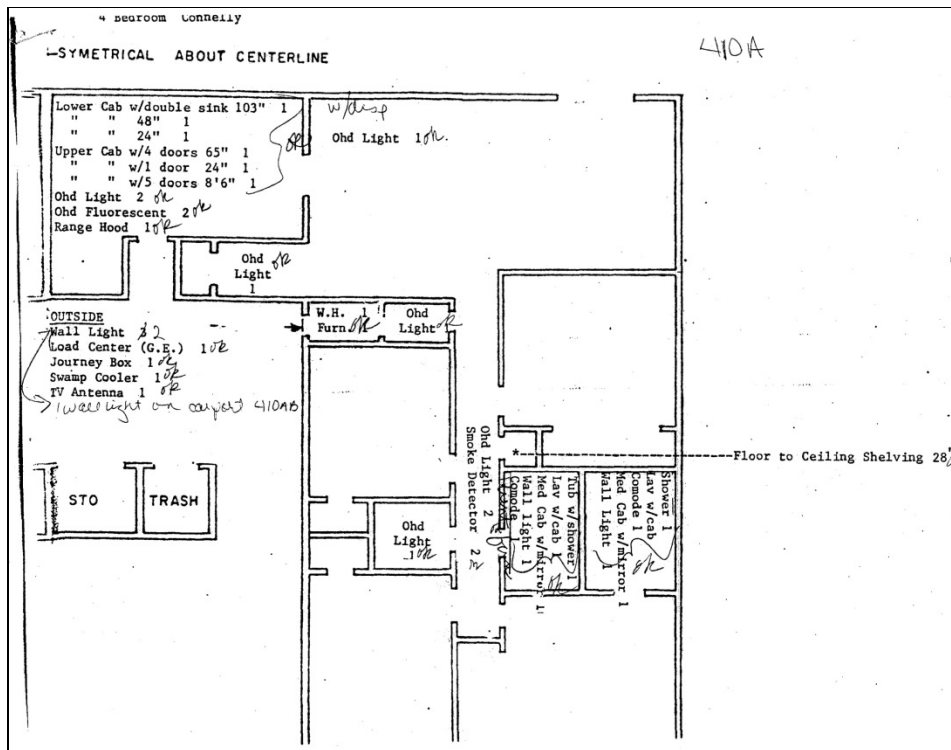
Conelly Duplex Unit plan with structure center to the left.
